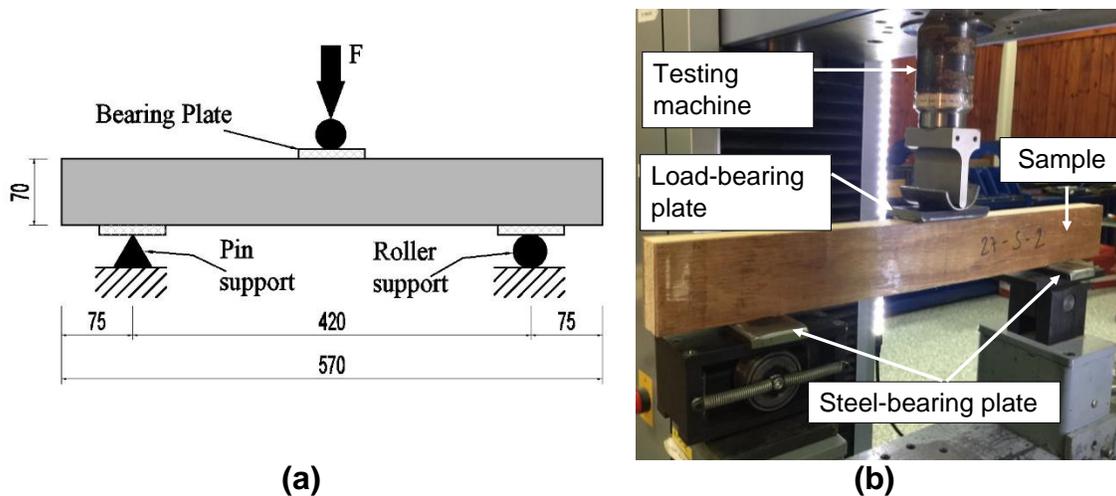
Longitudinal-tangential shear test set-up, (a) schematic and (b) photo
